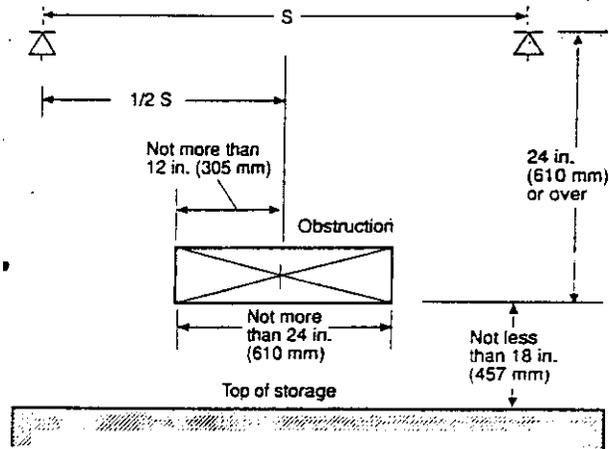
Position of sprinklers in relation to obstructions located 24 in. (610 mm) or more below deflectors.
